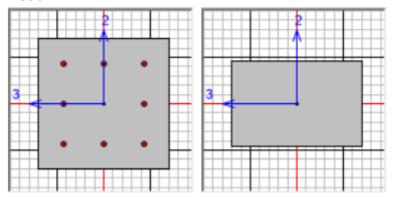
Dimensions for beams (left) and columns (right) for the structure
